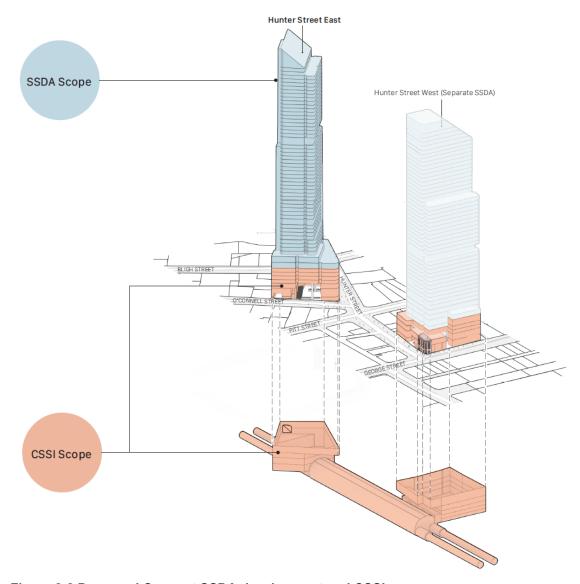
Proposed Concept SSDA development and CSSI scope
